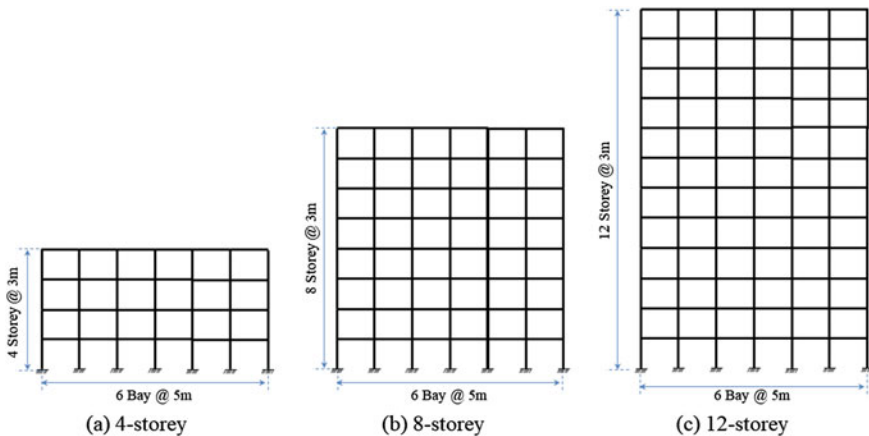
Elevation of 4-, 8- and 12-storey with a uniform bay width
